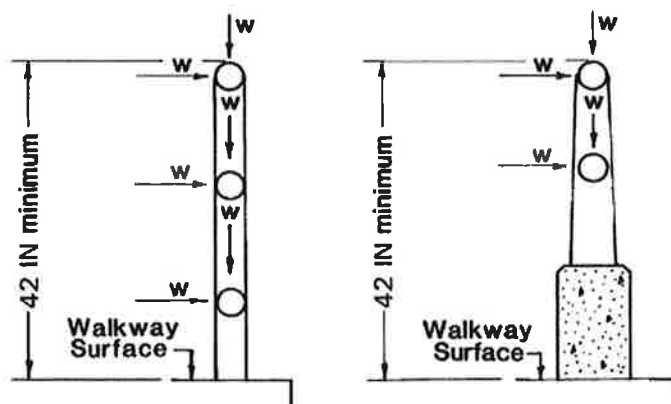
Pedestrian Railing Loads—To be used on the outer edge of a sidewalk when highway traffic is separated from pedestrian traffic by a traffic railing. Railing shape illustrative only.
